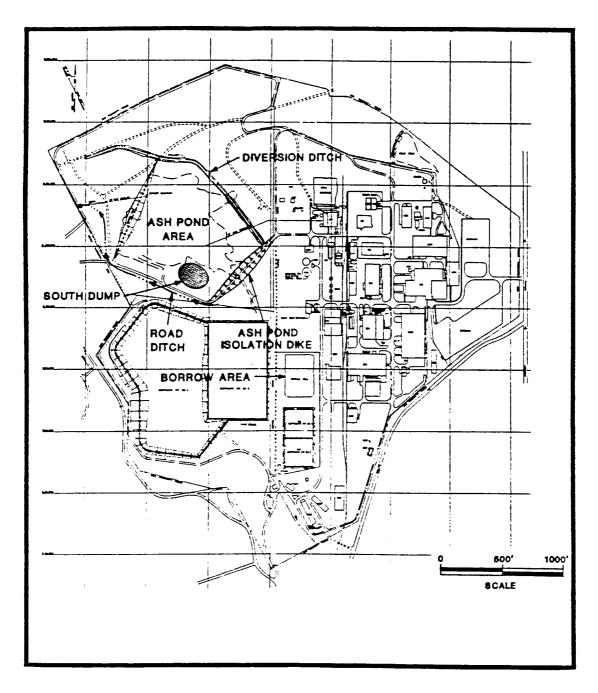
Location of Proposed Dike and Borrow Area (Source: Modified from MK-Ferguson and Jacobs Engineering 1987)
